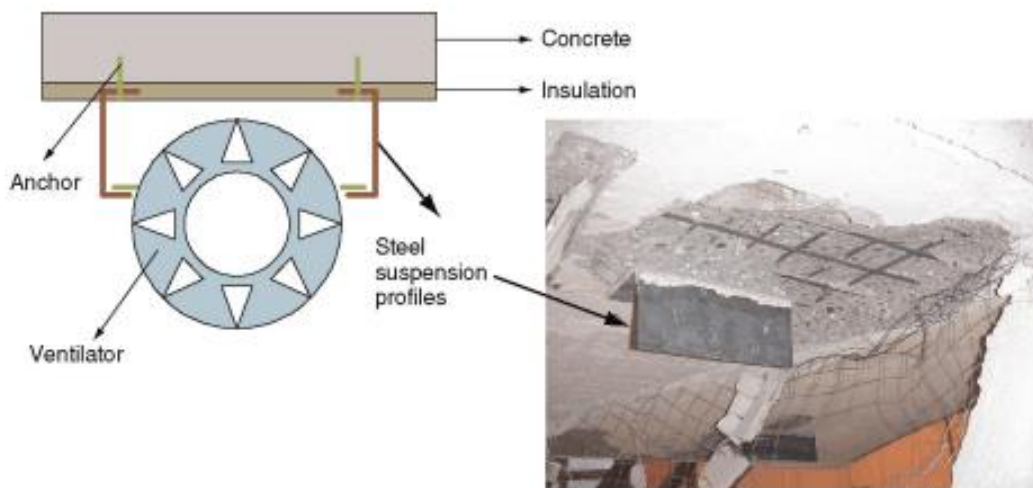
Example of spalling due to poorly designed equipment fixings
